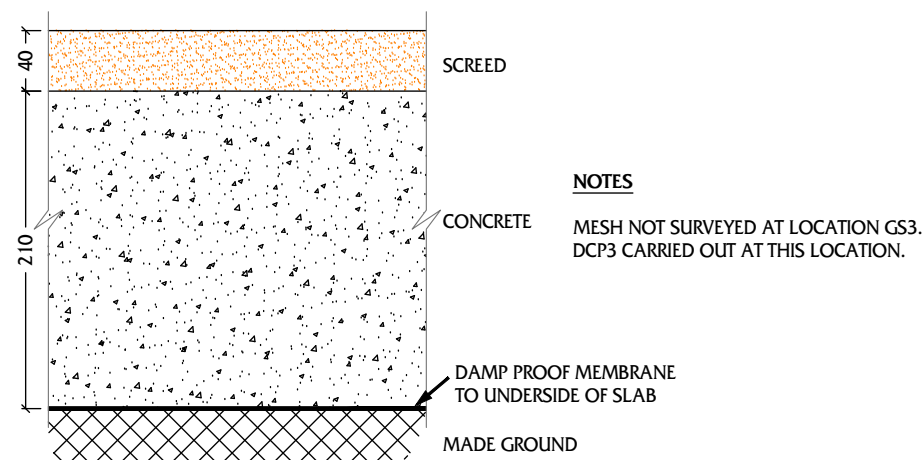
PART SECTION THROUGH GROUND FLOOR SLAB AT CORE C3 LOCATION (CRACK LOCATION) - SURVEY AREA GS3 SCALE 1:5
